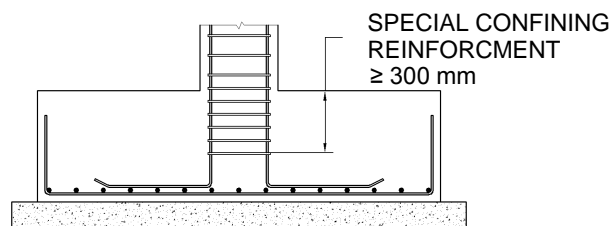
PROVISION OF SPECIAL CONFINING REINFORCEMENT IN FOOTING
